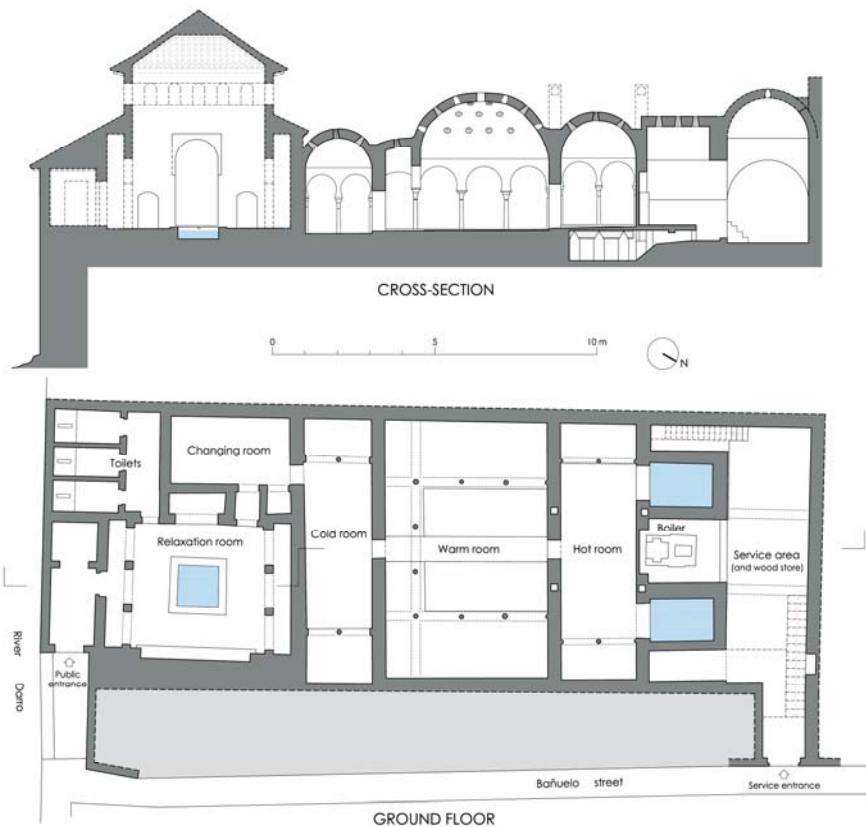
Hypothetical original ground floor plan and cross-section of El Bañuelo (After A. Orihuela & J.M. López-Osorio, 2019).
